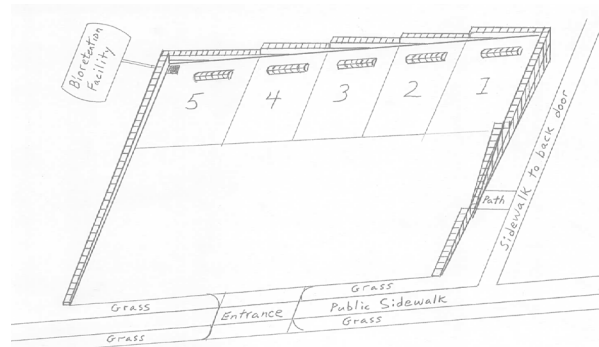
Segmental block stair-stepped retaining walls with paver stone bricks to match our church building
